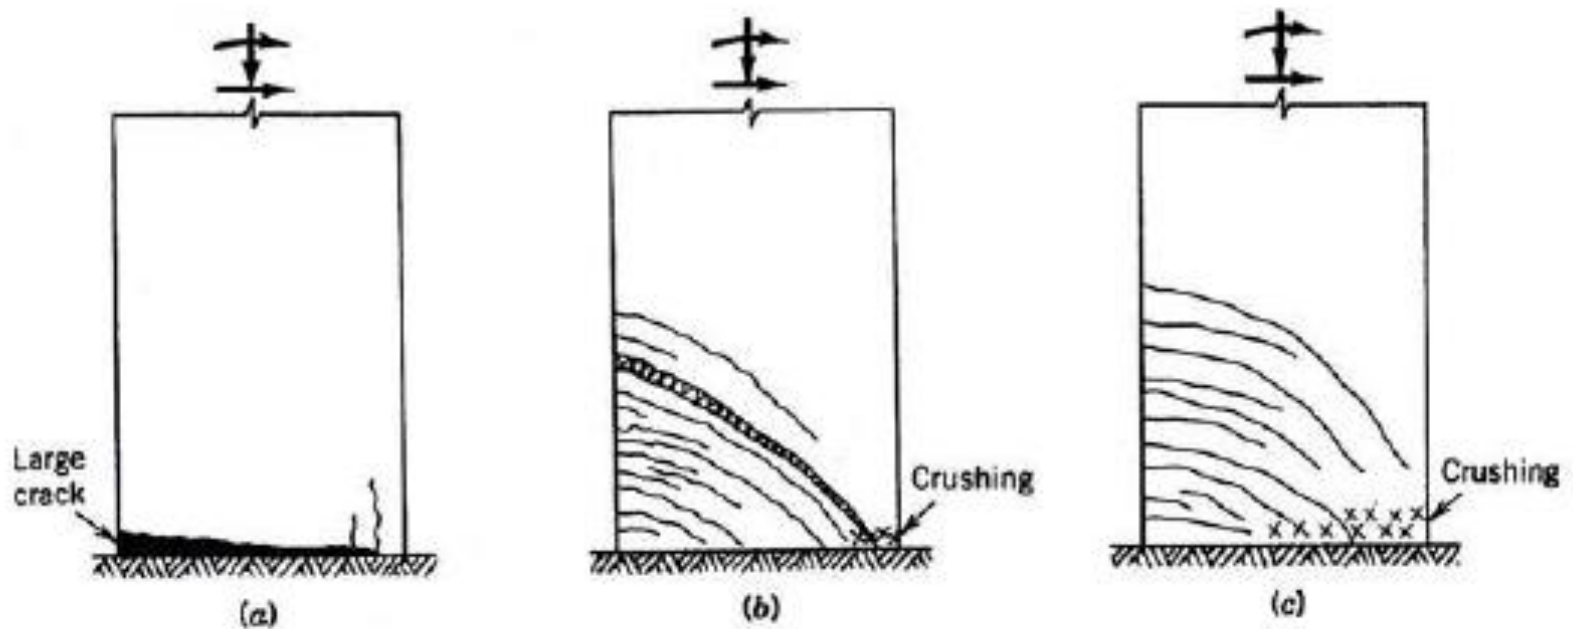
Failure modes: high-rise walls. (a) Fracture of steel. (b) Flexure-shear failure. (c) Failure by concrete crushing.
